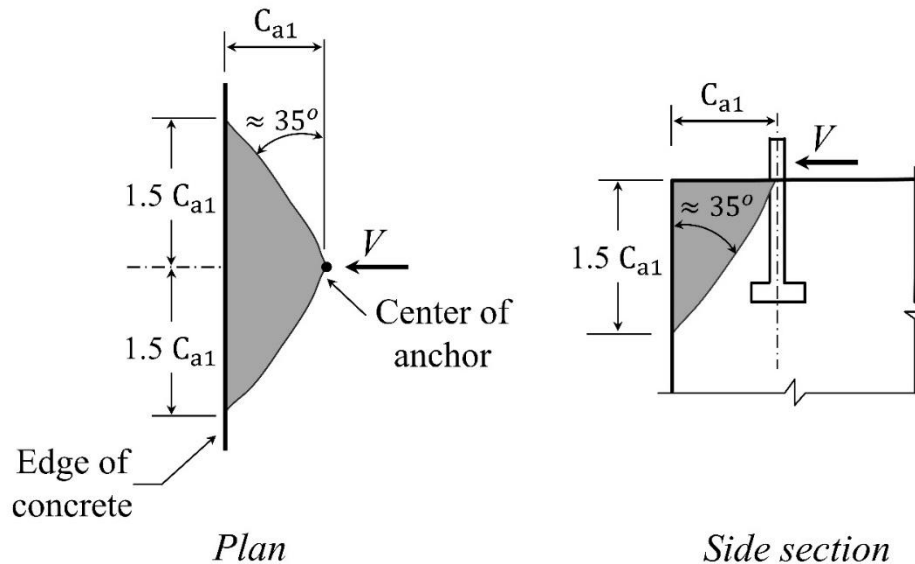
Concrete capacity design model for anchors loaded in shear towards free edge.
